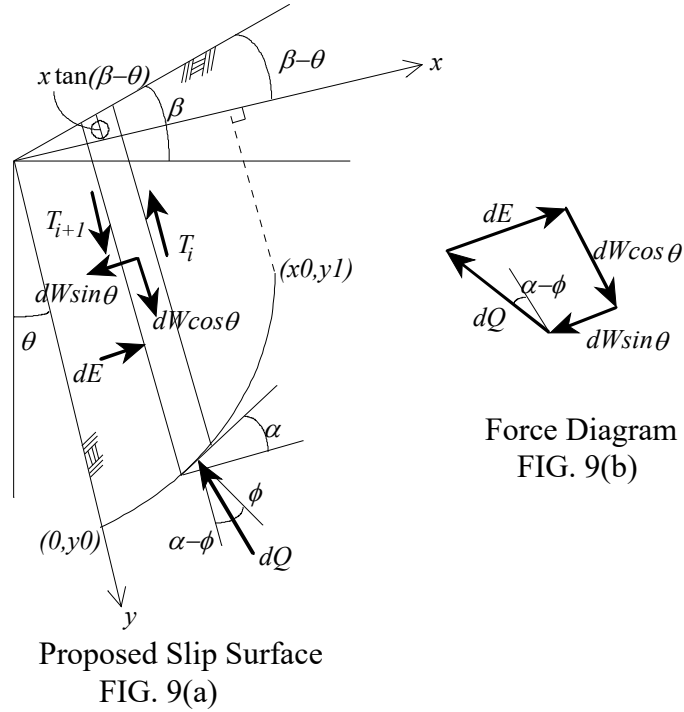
Slip Surface with a Sloped Backfill and Slanted Wall
